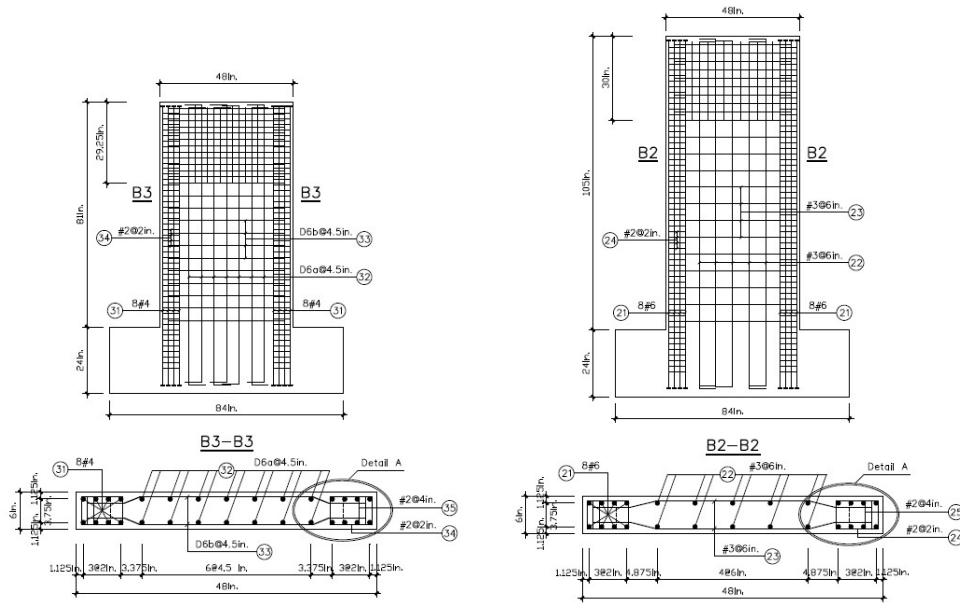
Typical Reinforcement Details for walls tested by Tran & Wallace (2014)
